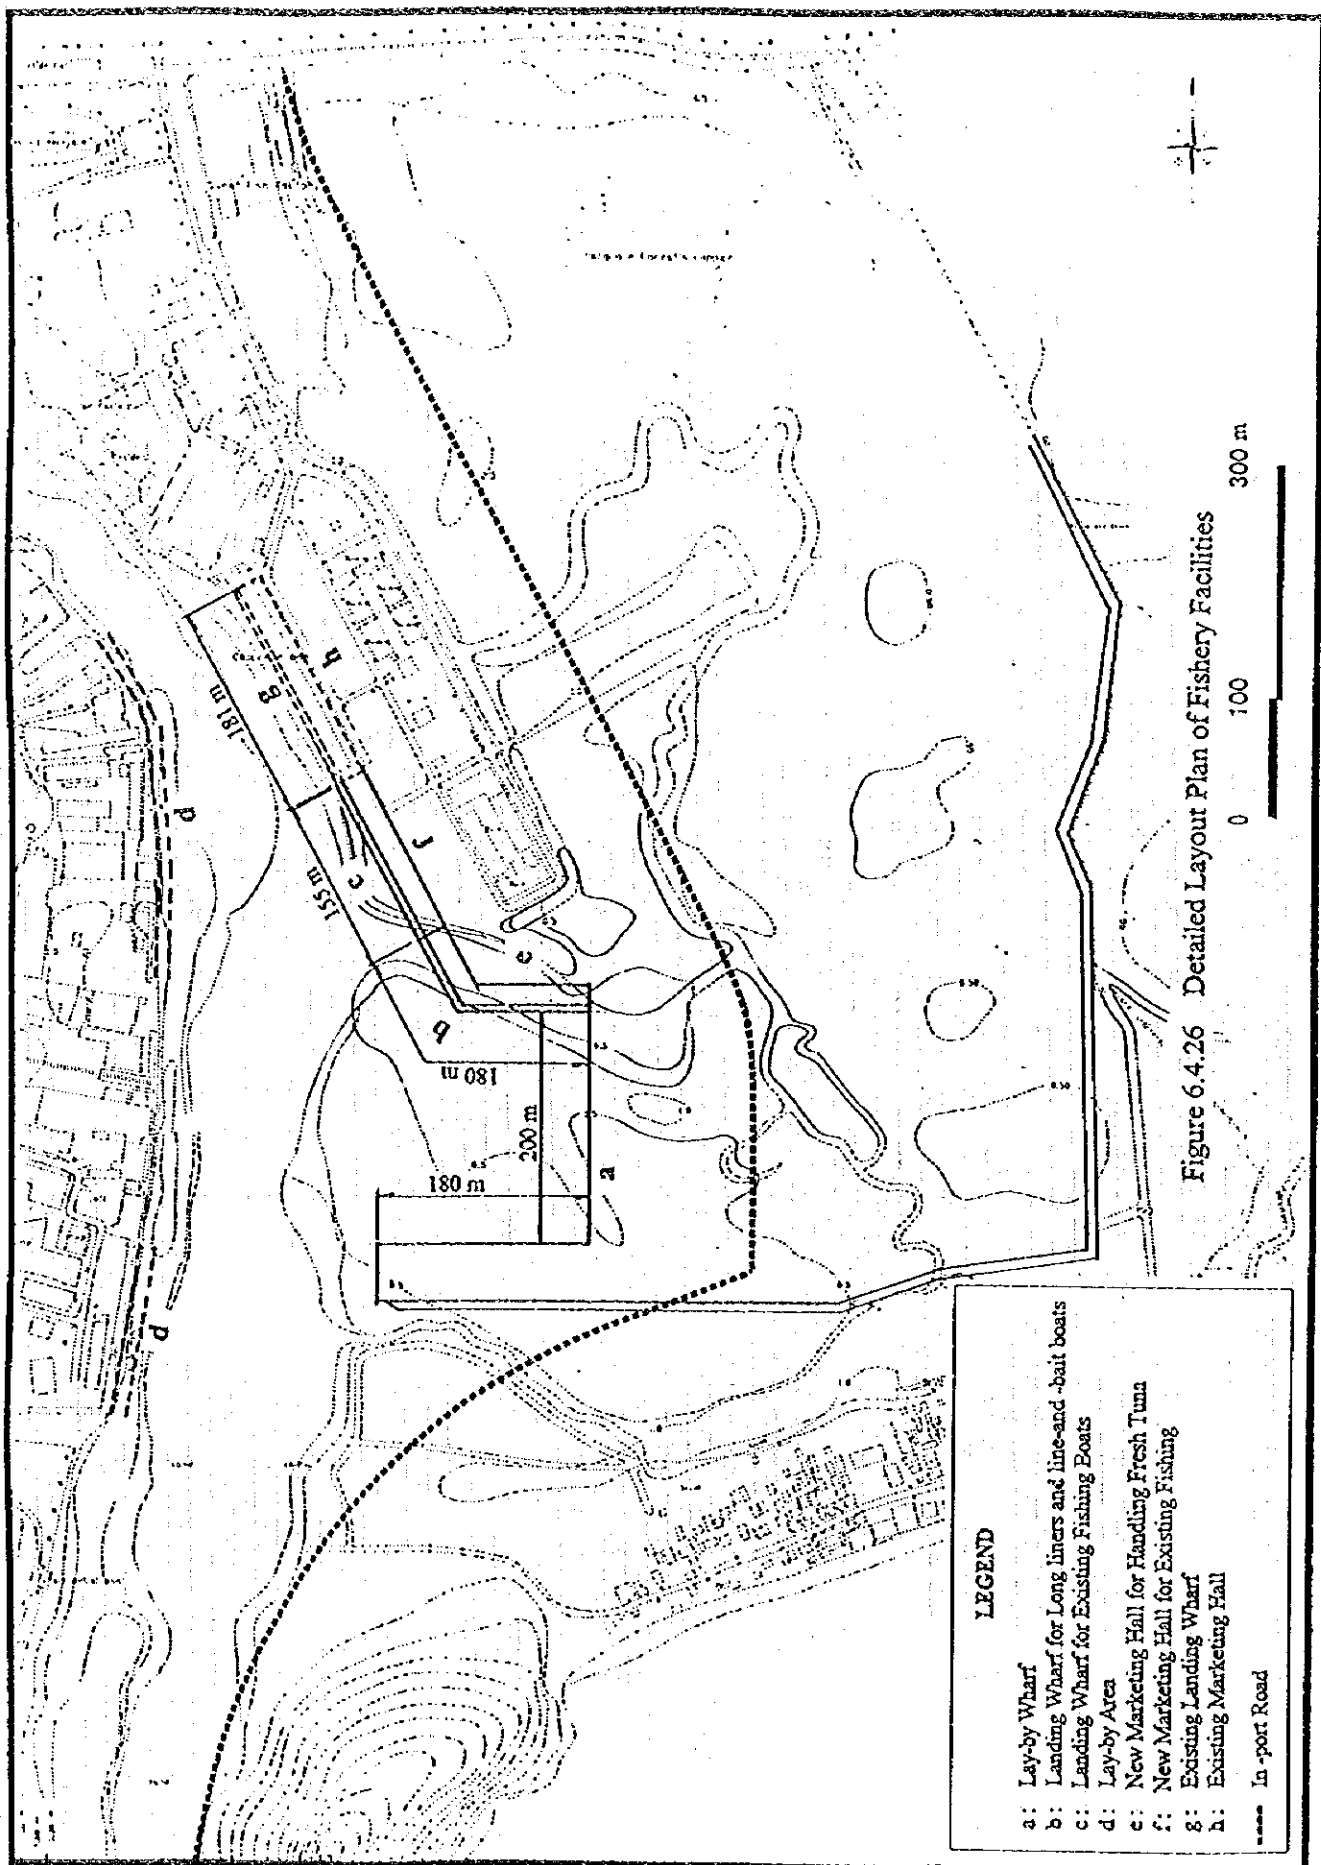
Detailed Layout Plan of Fishery Facilities
